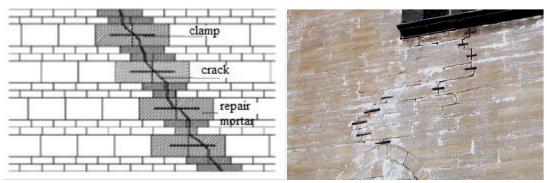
Repairing wide cracks by sewing, Source: Aköz, 2008.
